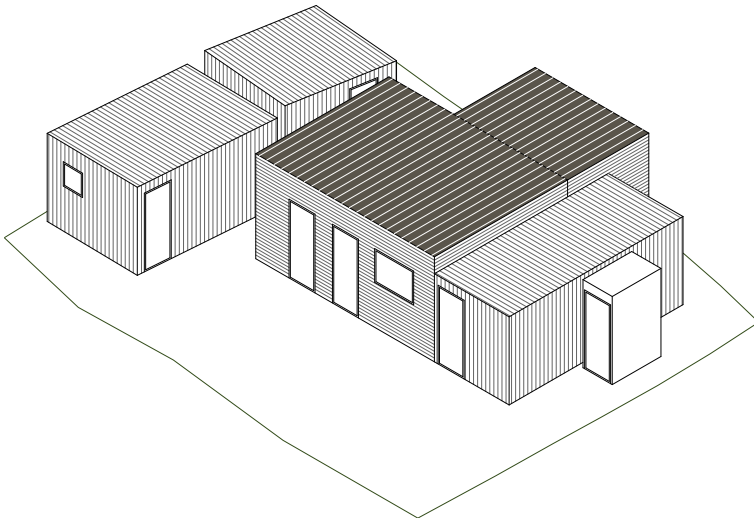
Shack rebuilt as brick house with brick extension and backyard shacks
